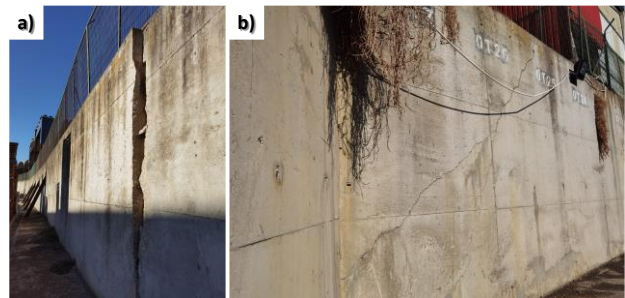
Pathologies at the retaining wall: a) excessive deformations b) cracks.
